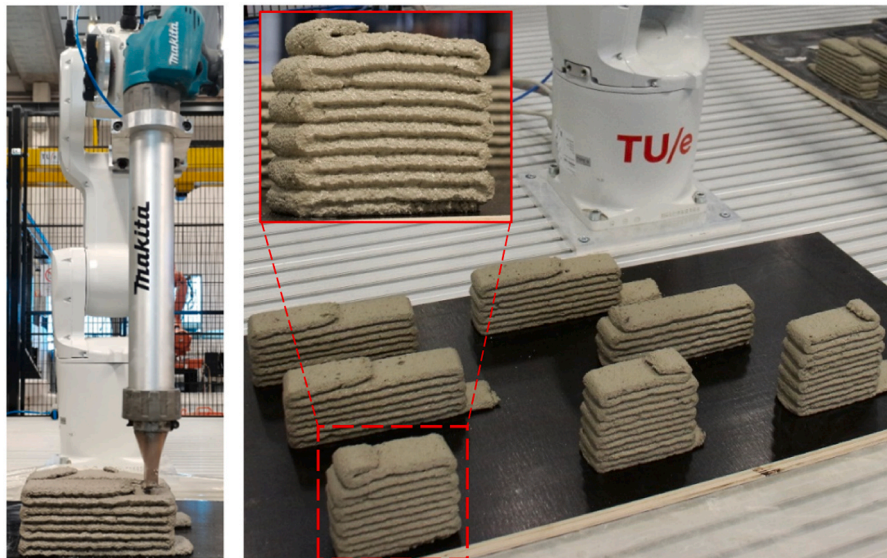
Printing setup of cork mortar (CR100) consisting of an extruder attached to the print head of a robot arm.
